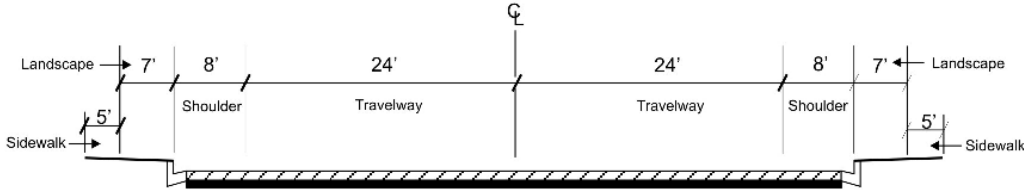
(1 OF 3): CITY OF CORONA GENERAL PLAN CROSS-SECTIONS
